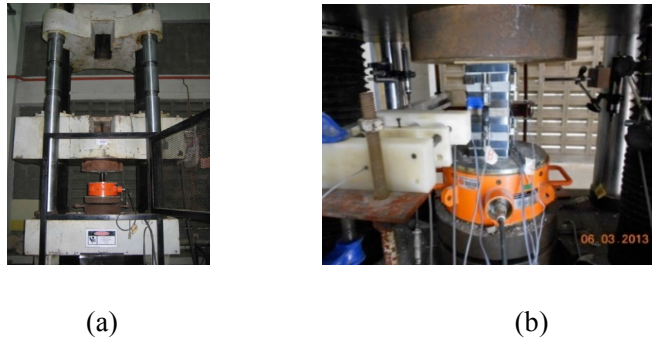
The Experimental Tools Used During Testing: (a) TINIUS OLSEN Super “L” Universal Testing Machine; and (b) Diagram for equipment (Lvdt's)
